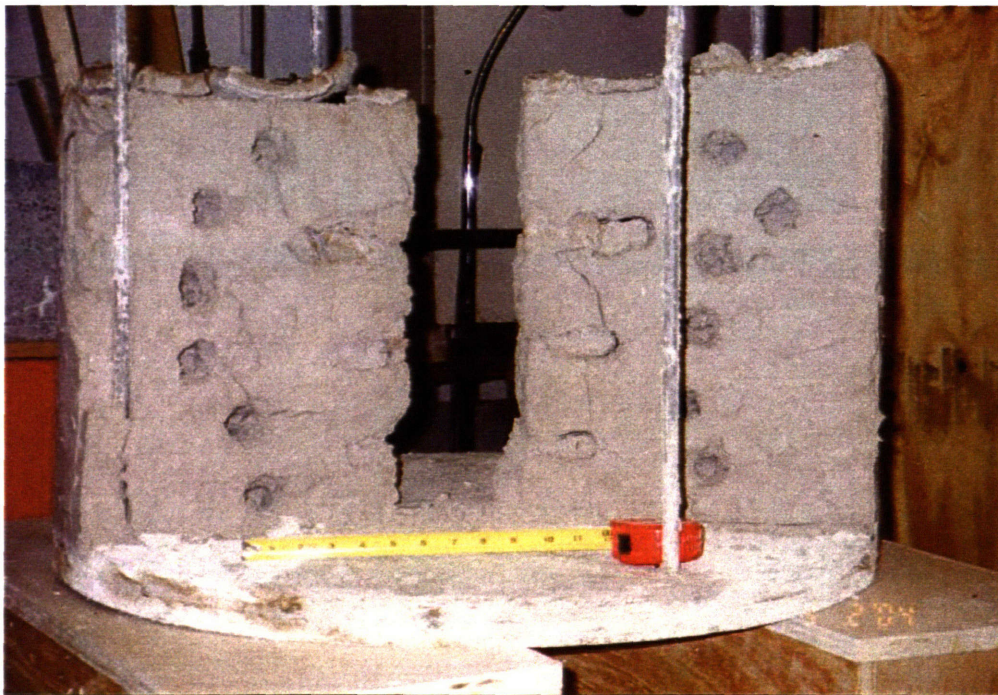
(f). View of exposed vertical soil face (Specimen T1, Section 3:left and Section 6:right)
